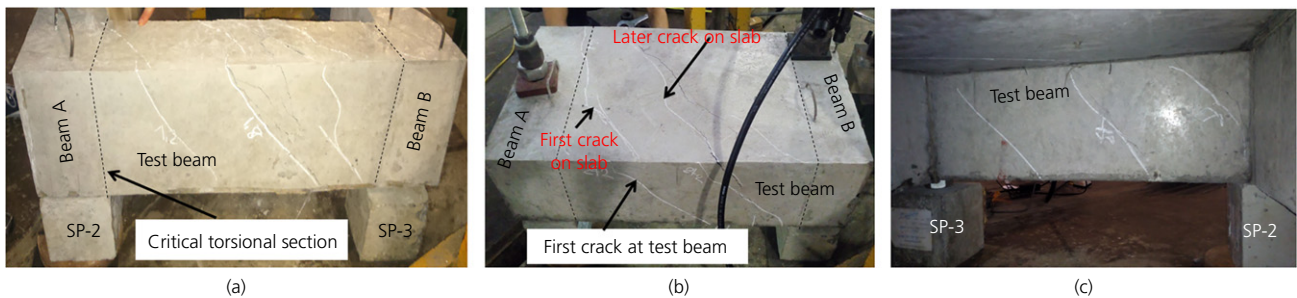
Crack patterns of specimens M1 (without slab) and M2 (with slab): (a) M1 (top and outer surfaces of test beam); (b) M2 (outer surface of test beam and slab top surface); (c) M2 (inner surface of test beam)
